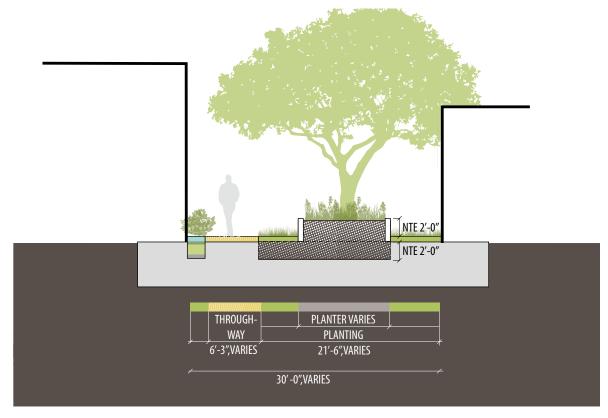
FLATS LANEWAY SECTION-TYPICAL
